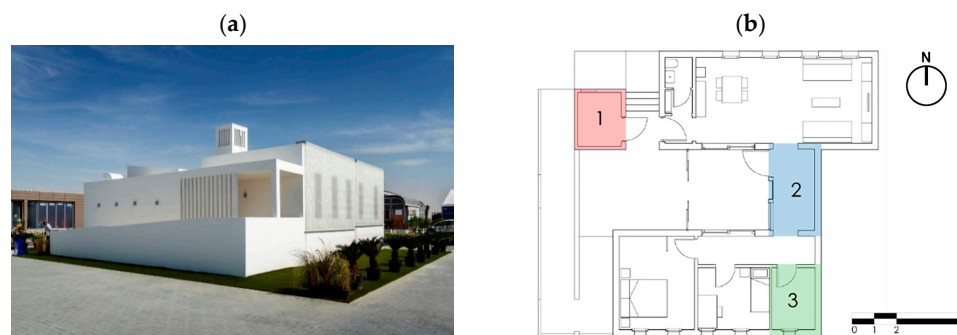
Team Sapienza's house. (a) Exterior photo. (b) Floor plan—1: technical room; 2: kitchen; 3: bathroom. (Photo: SDME 2018 Organization. Floor plan: by authors based on team Sapienza's drawings).
